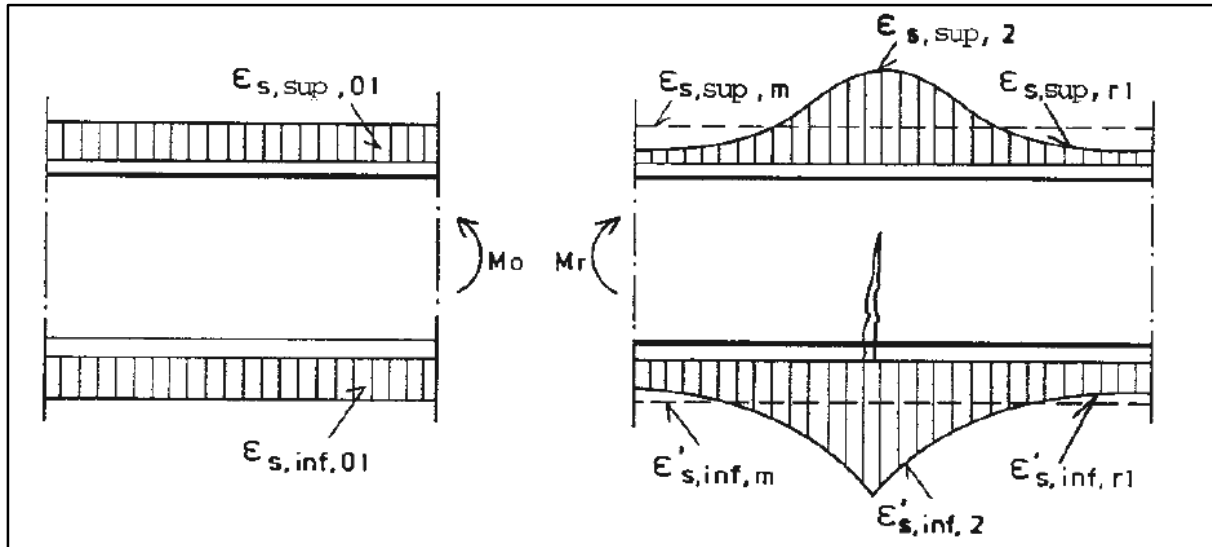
Steel Reinforcement Elongations prior to and subsequent to crack formation
